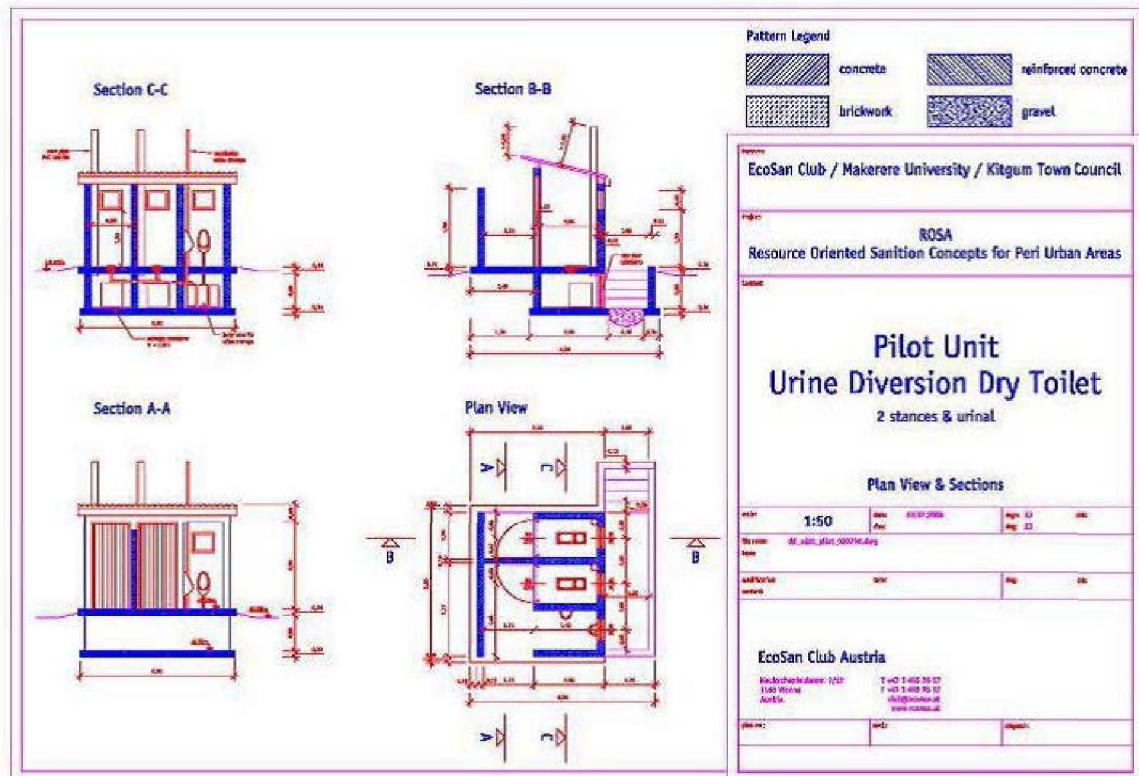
Floor plan of two stances UDDT (ROSA Kitgum, 2009)
